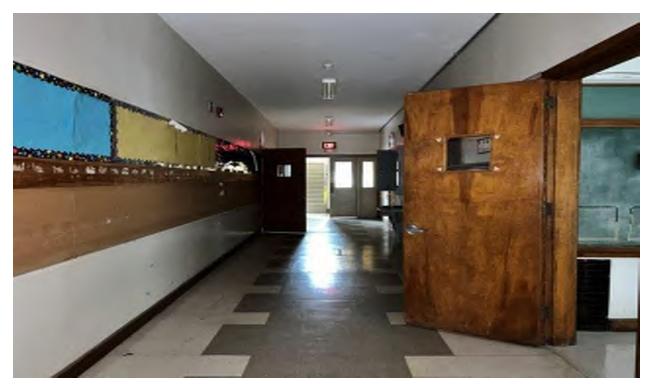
Typical hallway in the central portion of Building 2 (facing northeast). PN: 151031201
